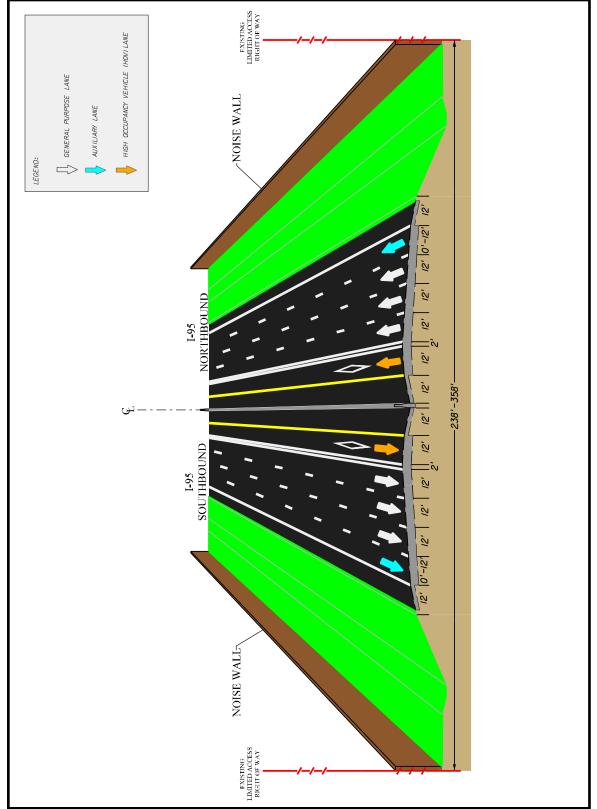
No-Build Alternative Typical Section between Oakland Park Boulevard and Commercial Boulevard
